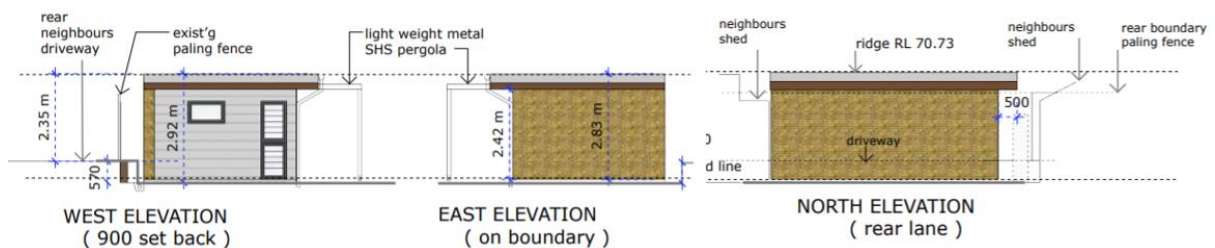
West, East & North Elevation (Dwg 2 dated 14 October 2021)
